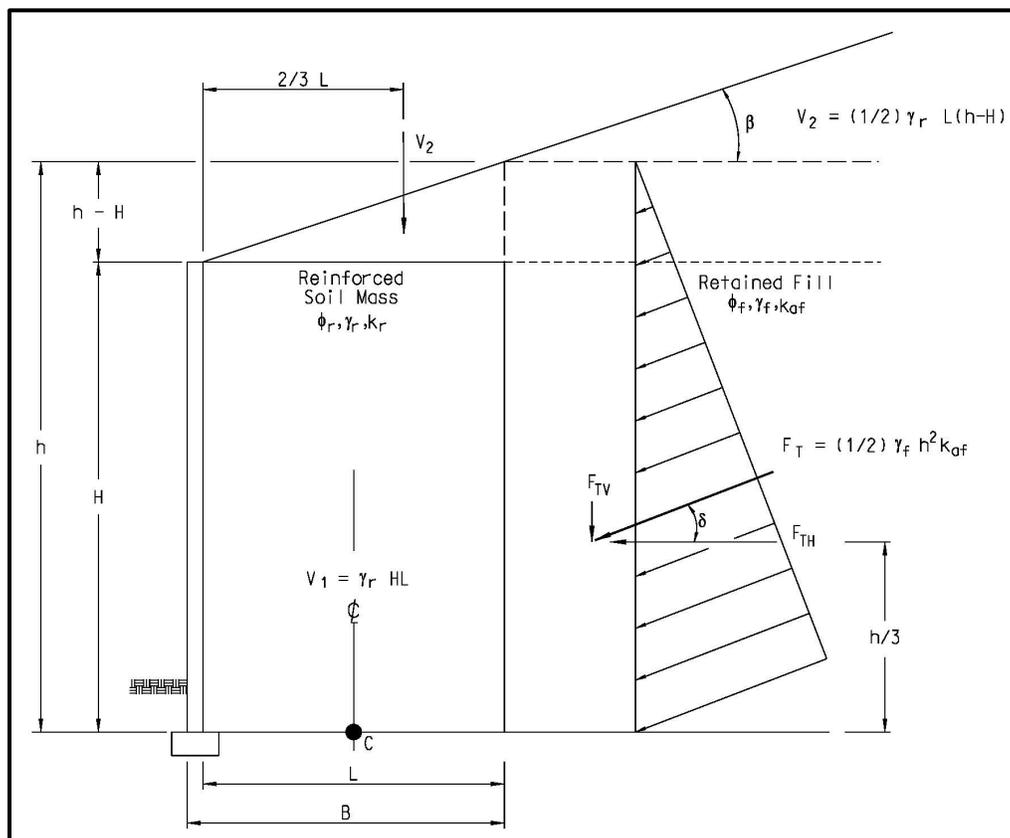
, MSE Wall Earth Pressure for Sloping Backfill (modified AASHTO LRFD Specifications)
